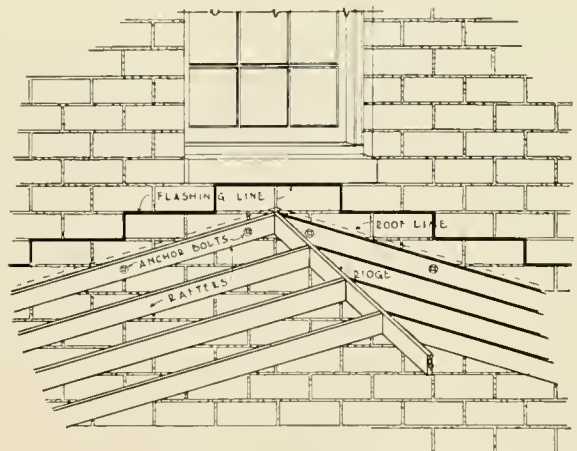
Detail showing method of fastening and flashing of porch against Hollow Tile walls.
